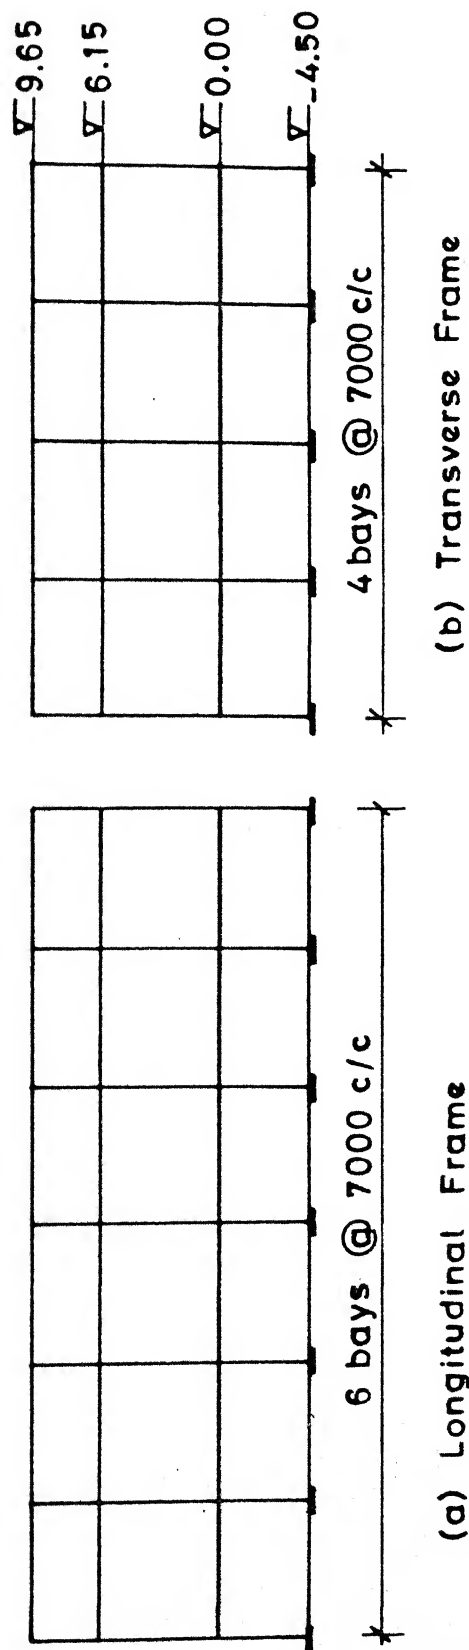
STRUCTURAL SYSTEM OF THE INDUSTRIAL BUILDING.
